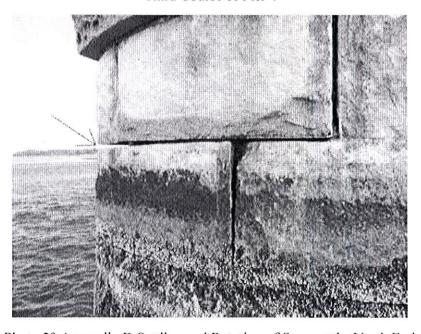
Photo 50 Appendix D Settling and Rotation of Stone at the North End of Pier 11
